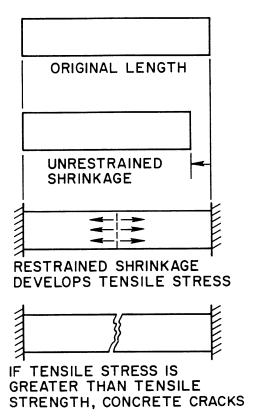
Cracking of concrete due to drying shrinkage.
